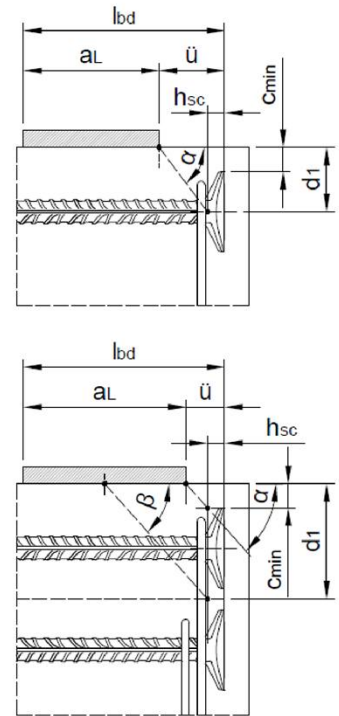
Anchorage length in the corbel for single or multiple layer of reinforcement
